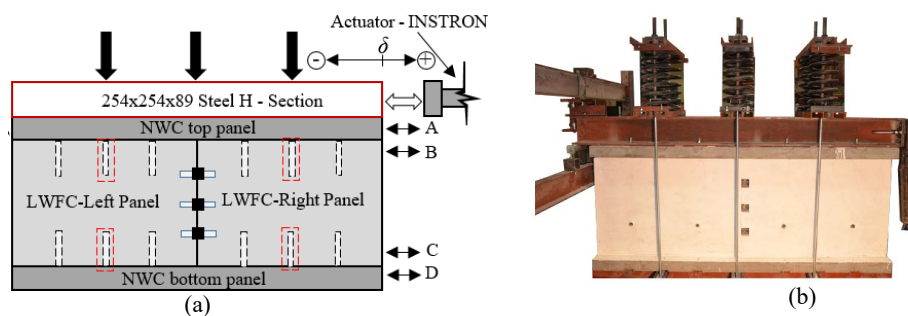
Test setup of the wall panels (a) illustration indicating loading, displacement measuring and load application site, and, (b) before testing commences (Dunn, van Zijl, and van Rooyen (2018))
